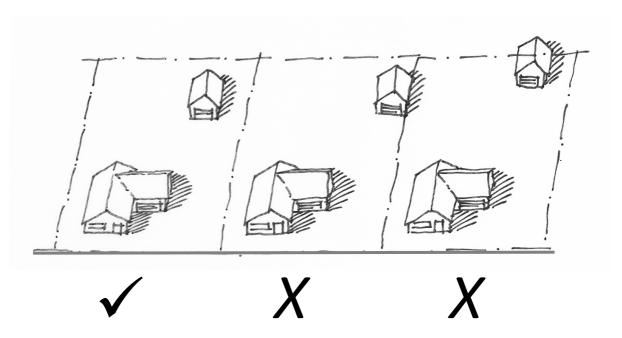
Outbuildings should not be built on the side boundary if there is a existing dwelling on the adjacent side boundary. This creates unnecessary visual intrusion at the side setback and may impact on the amenity of neighbouring dwellings
